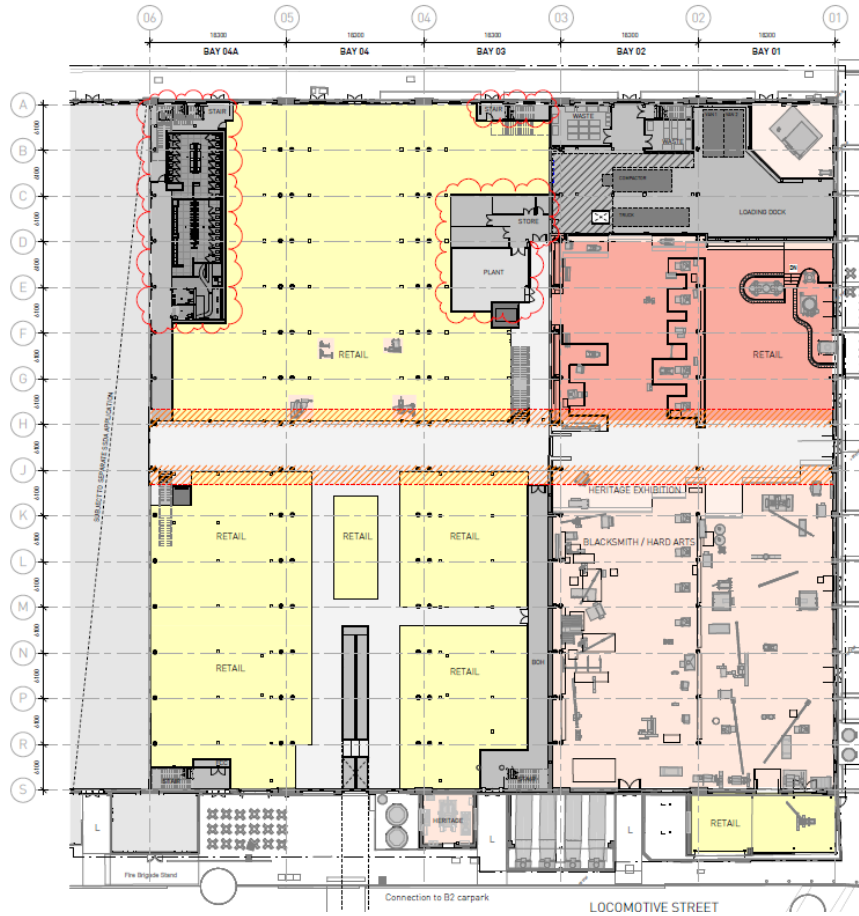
Current SSD 8517 Approval: Ground Floor Plan (Source: Sissons, 2019)
